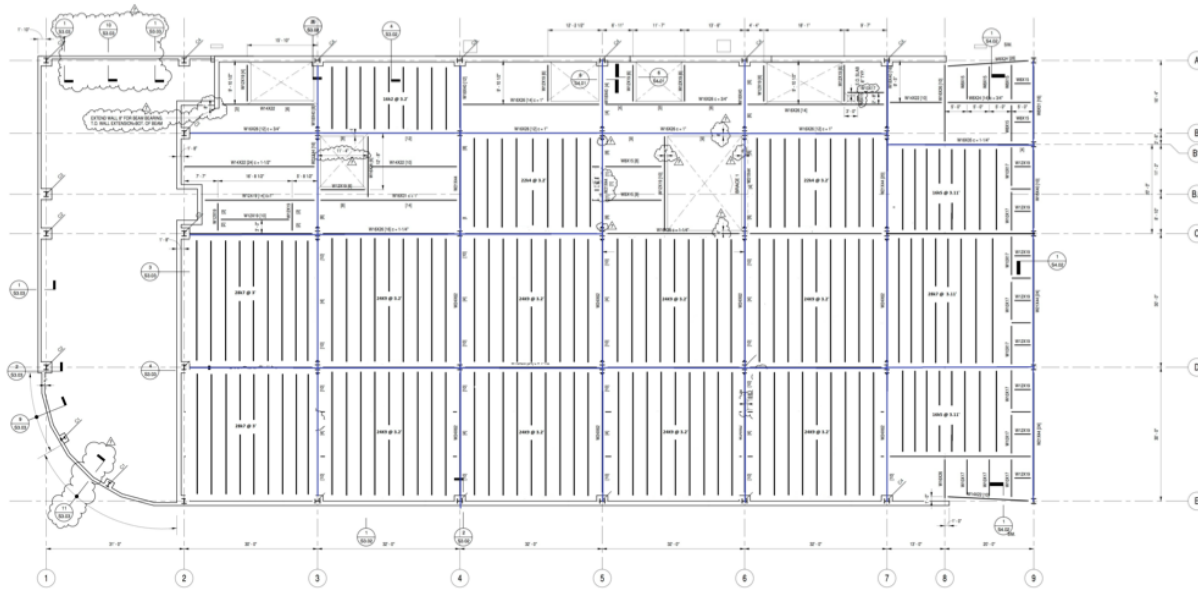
2nd Floor Layout of Open-Web Bar Joists
